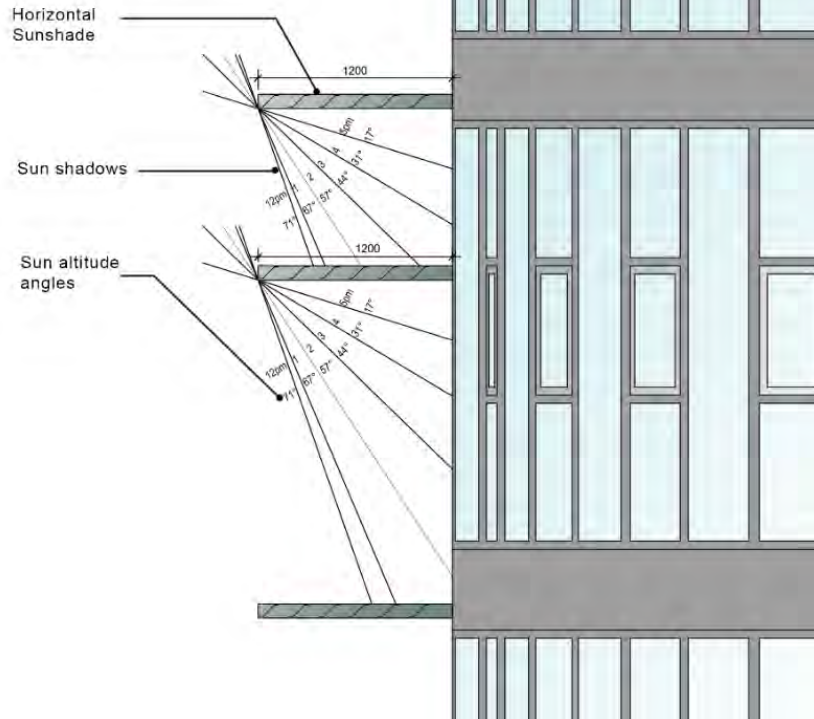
Section of west facade showing depths of shadow angles with double horizontal shading
